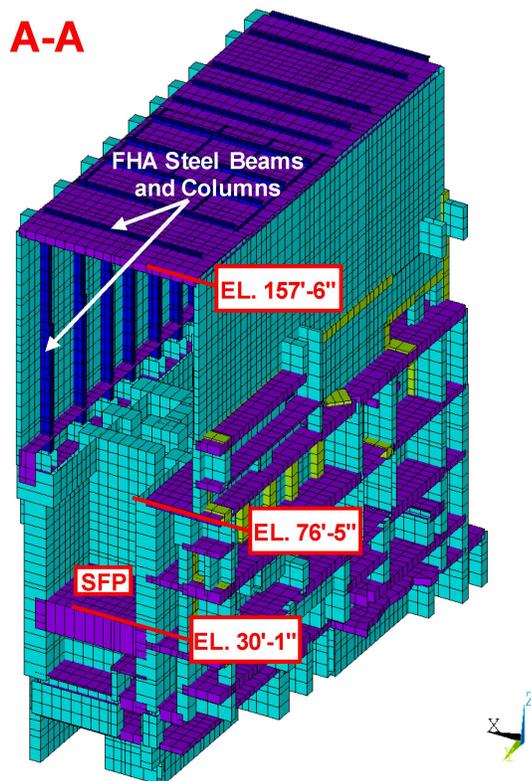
Section Cut A-A: Fuel Handling Area Including Structural Steel Framing
